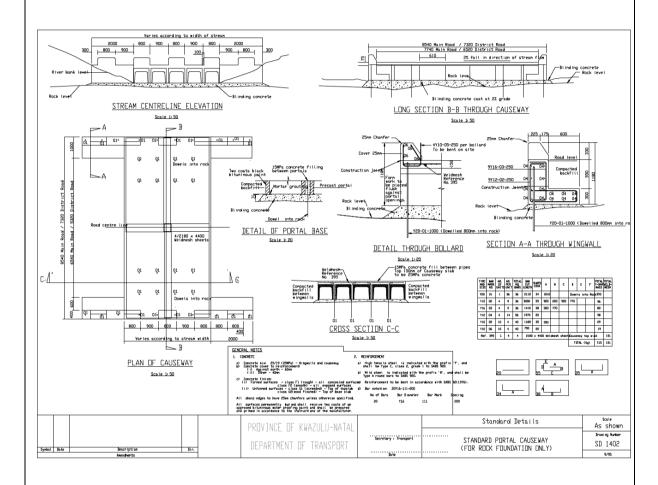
showing the cross section of the causeway (Drawing no. SD1402)
